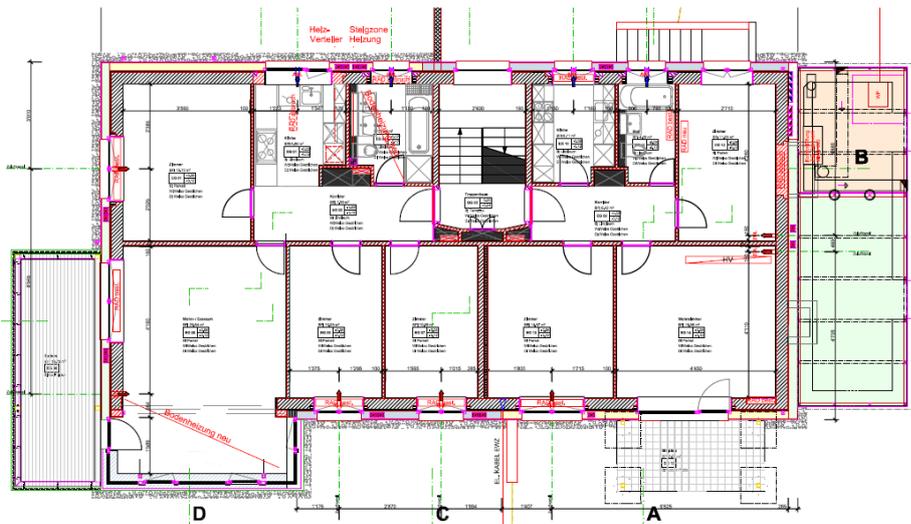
typical floor plan showing extension for heat pump and ventilation system for the existing apartments
